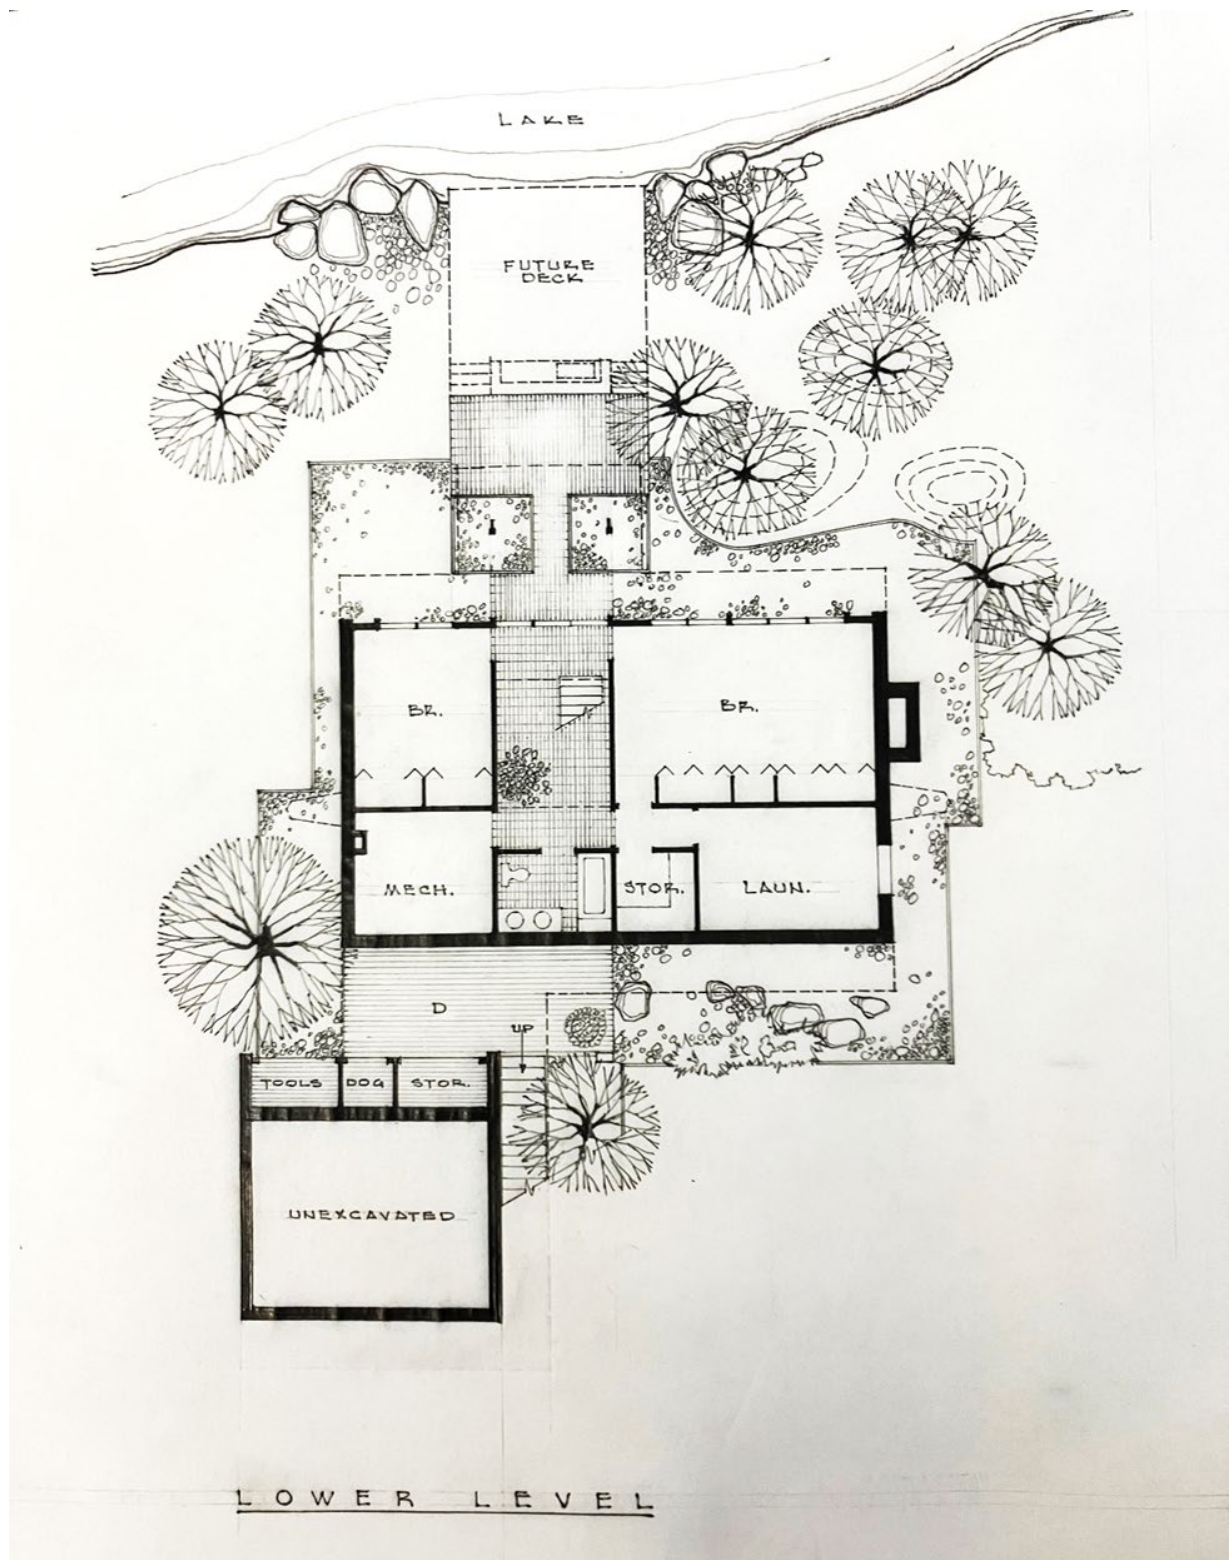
Presentation drawing, lower level floor plan. Close Associates Papers
